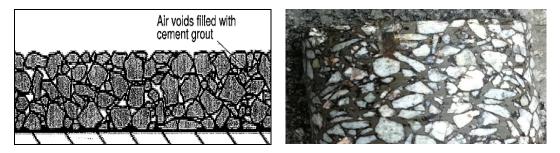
Porous asphalt concrete (left) and a semi-rigid pavement cored sample (right)
